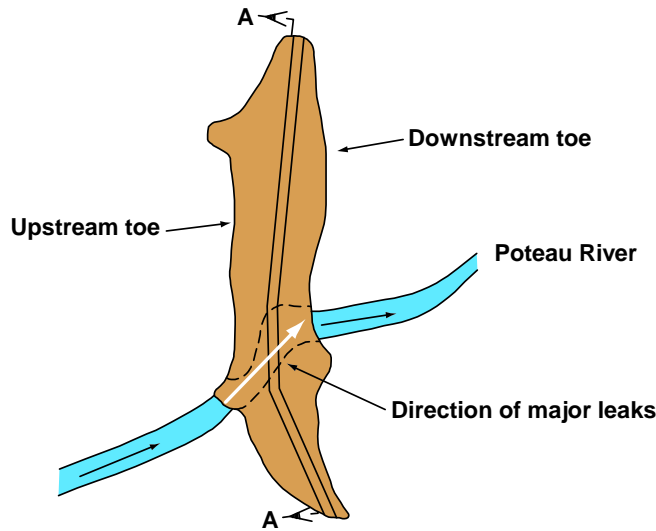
Plan View of Wister Dam showing flow path for internal erosion tunnels in fill.
